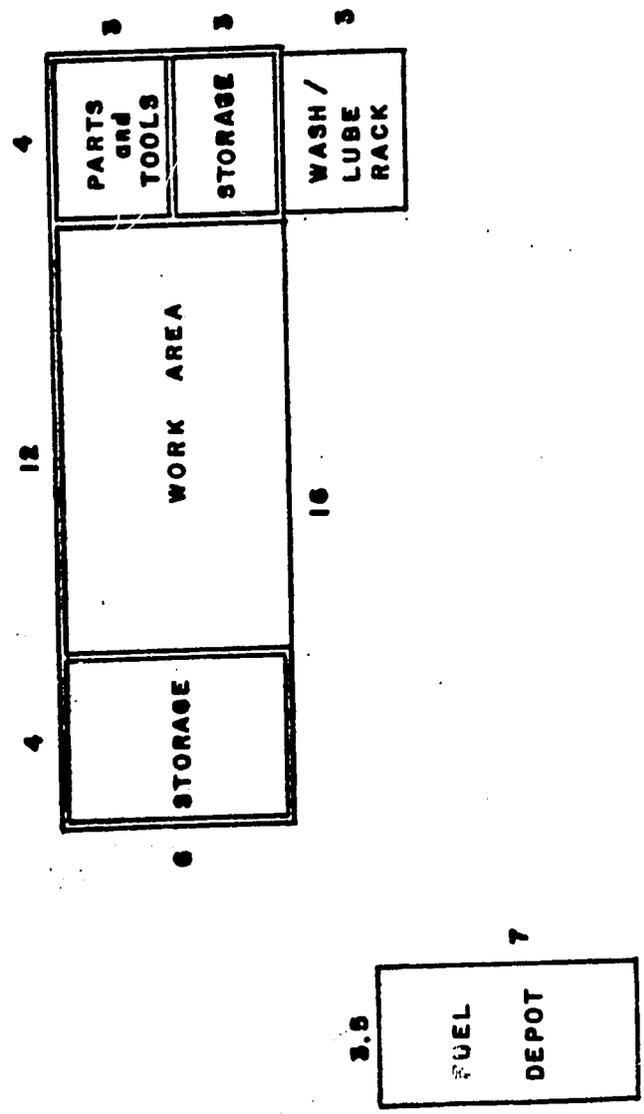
GARAGE/WORKSHOP FLOOR PLAN
